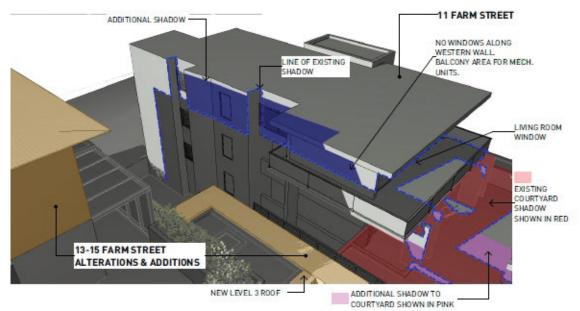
Additional overshadowing onto 11 Farm Street at 3pm to a bedroom and study room window and minor increase to the courtyard.
